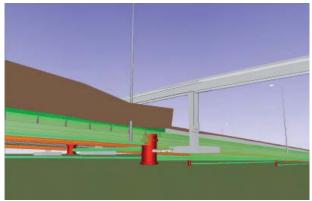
M25 DBFO UNDERGROUND INFRASTRUCTURE
